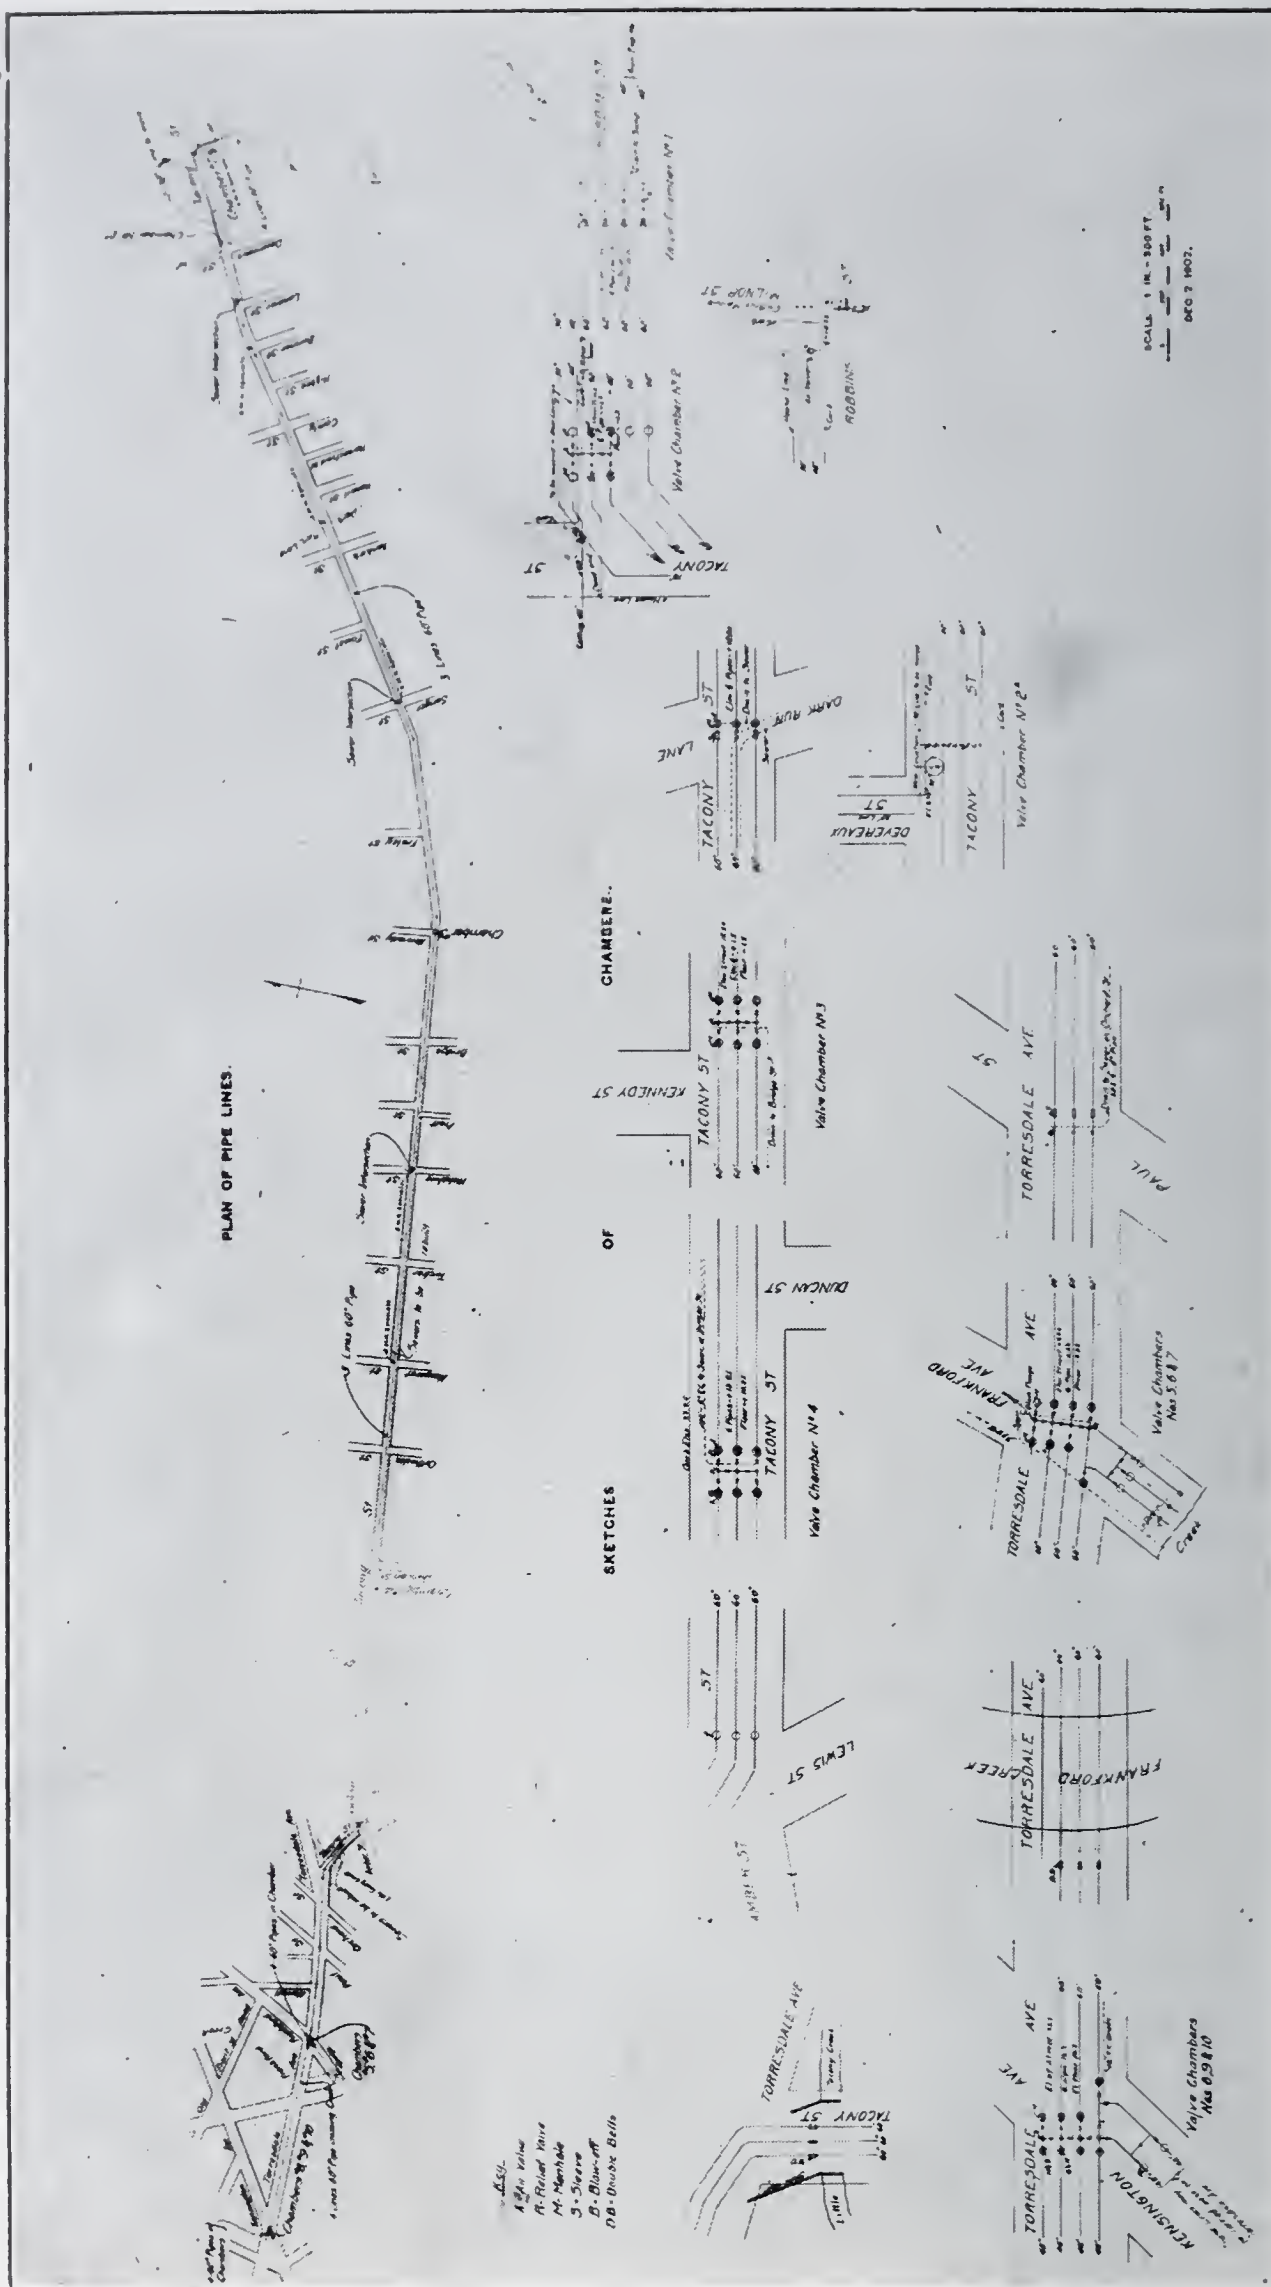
LARDNER'S POINT PIPE DISTRIBUTION<sup>4</sup> SYSTEM—GENERAL PLAN.
